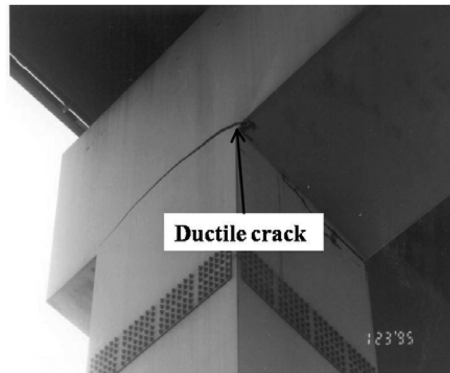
Ductile fracture in steel bridge piers in the 1995 Kobe earthquake
